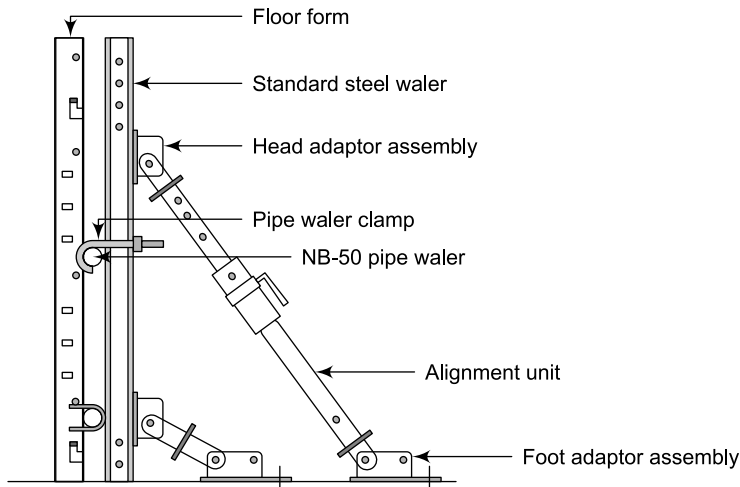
Sectional View of All Steel Foundation Formwork.
